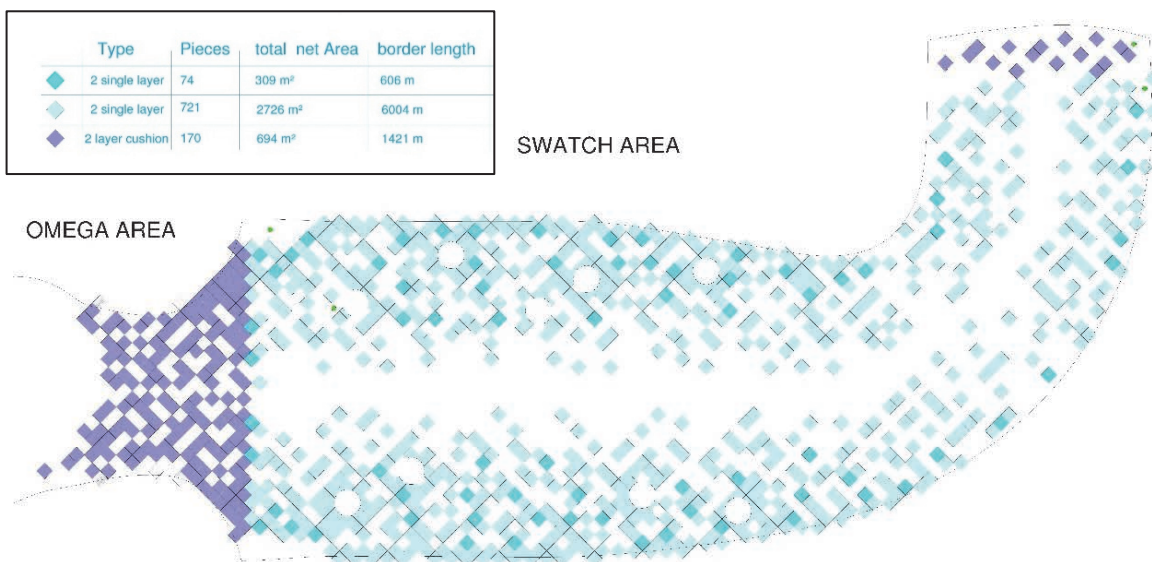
Ground plan view of the Swatch building – 3 ETFE-module types, ©Taiyo Europe
